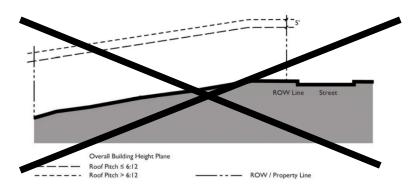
B. Pitched roof building height measurements (not drawn to scale).
